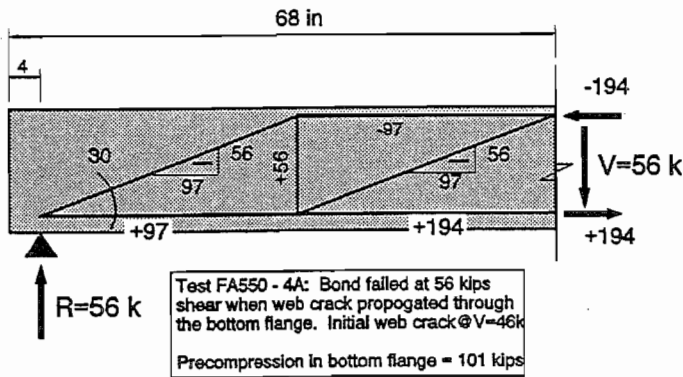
Truss Model of Shear Load at Failure Test FA550-4A
